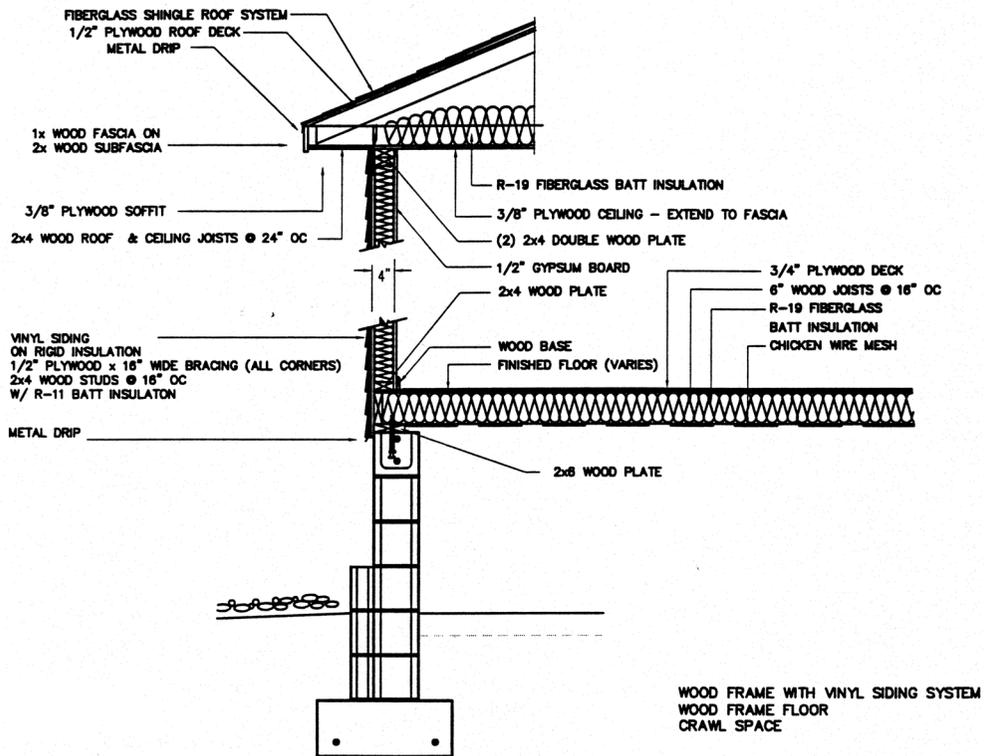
Details of test module (C-1) of current construction practice with stem-wall (crawl space) foundation.
